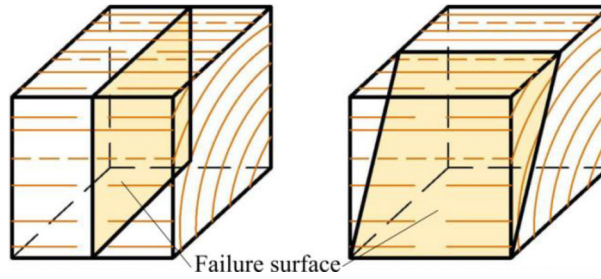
Typical failure surface for: fibre tension (FT) failure mode (left); rolling shear (RS), failure mode (right)
